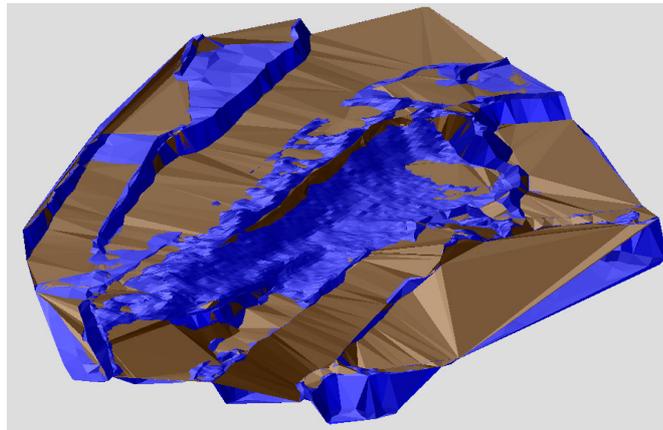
The surface of the work area; brown – the surface before the explosion; blue – the surface after the explosion.
